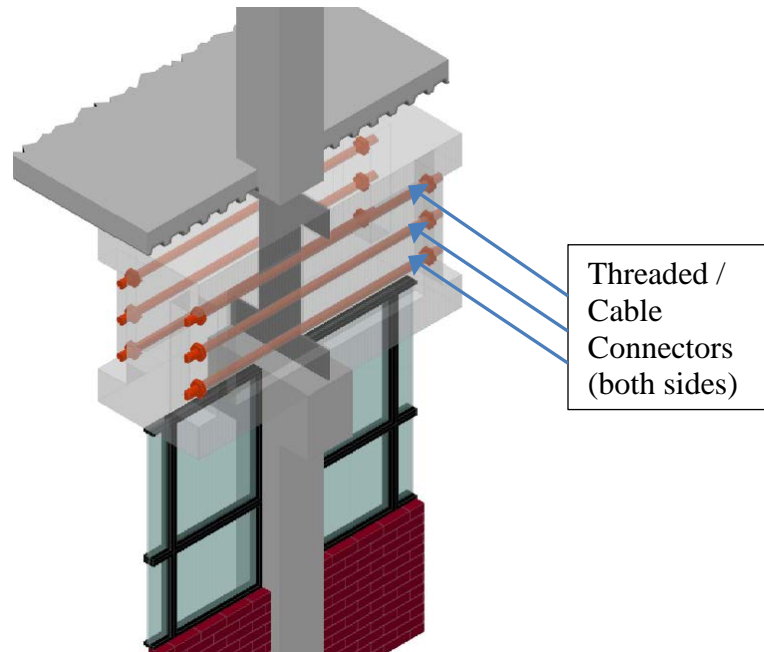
Beam to Beam Cable or Threaded Rod Connectors
